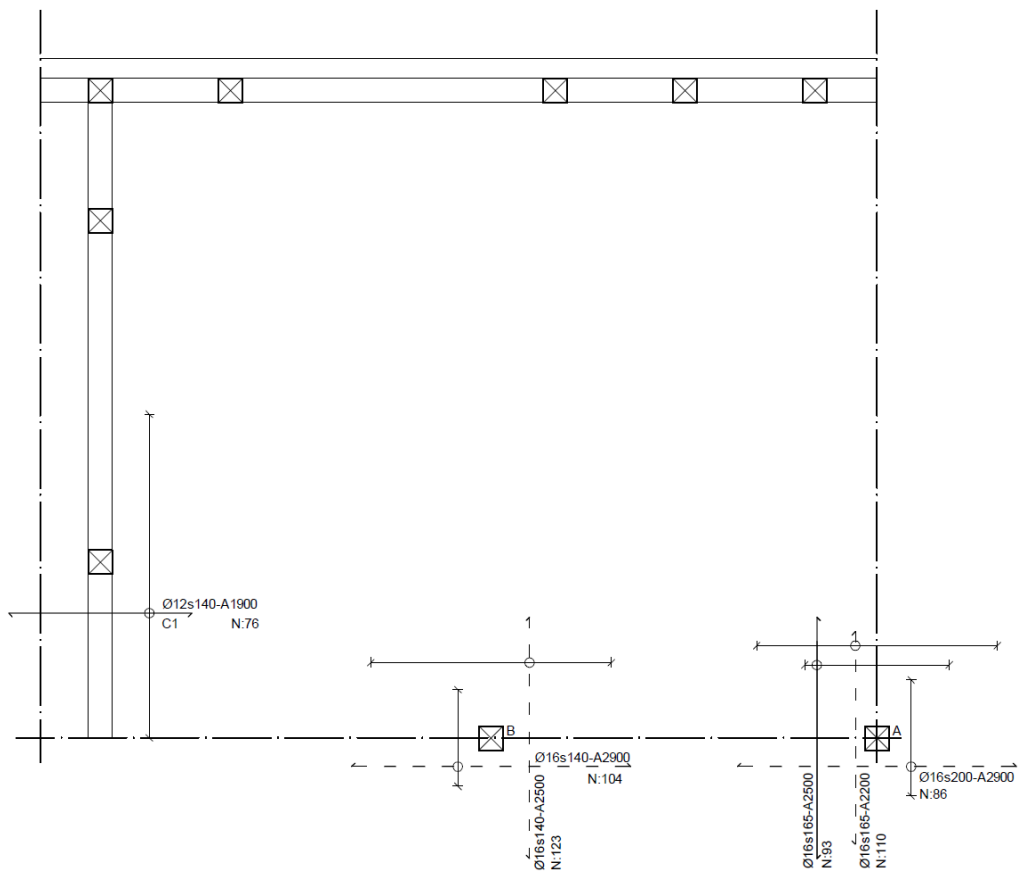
Needed arrangement of steel reinforcement with regard to the need in the serviceability limit state.
